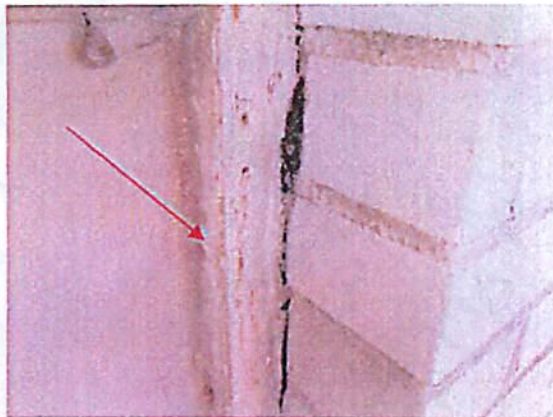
View of window glazing compound (HA-F) on windows throughout the building.
